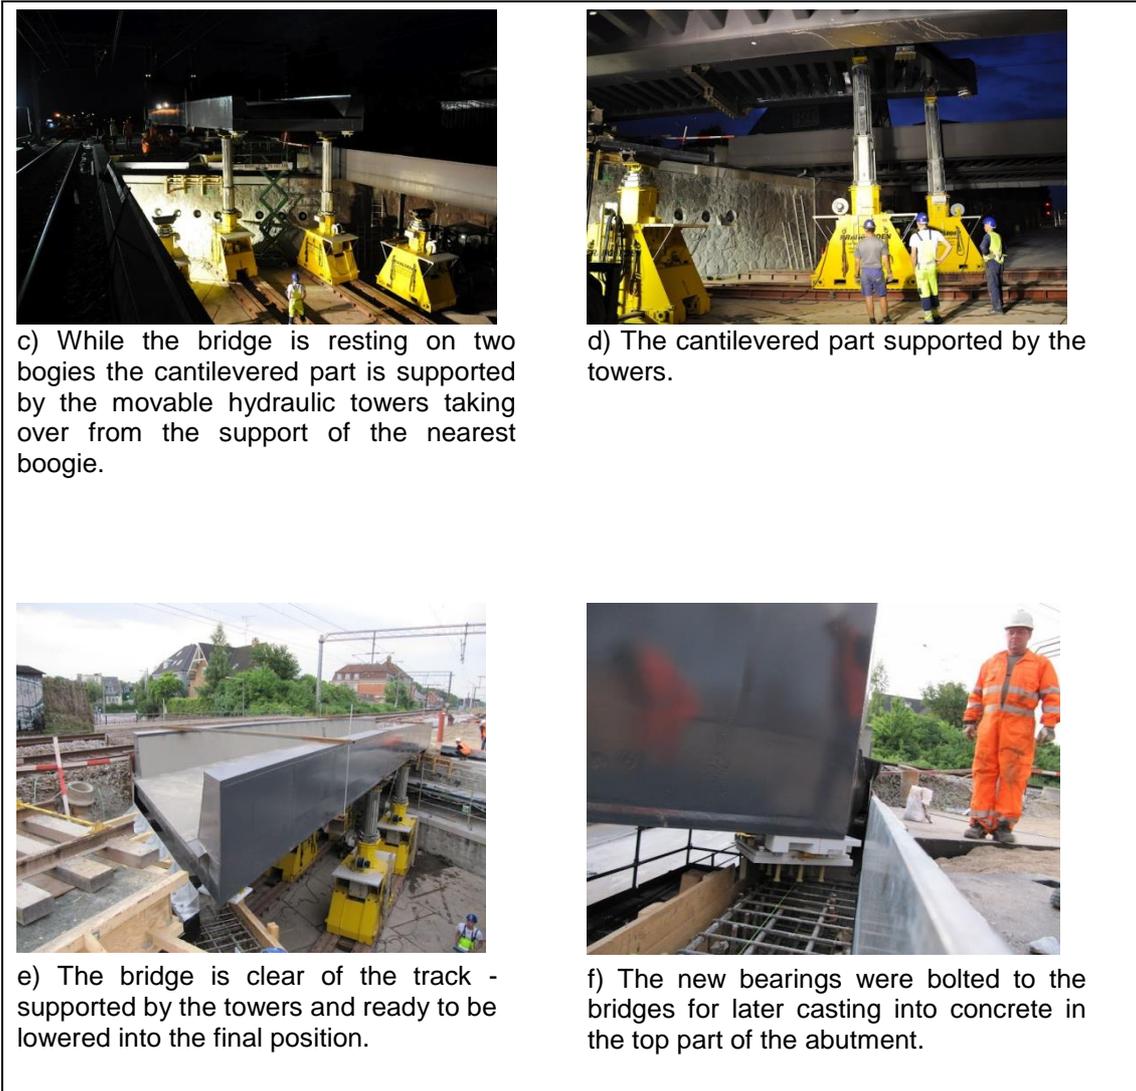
Replacing a steel superstructure launched from rail with hydraulic towers
